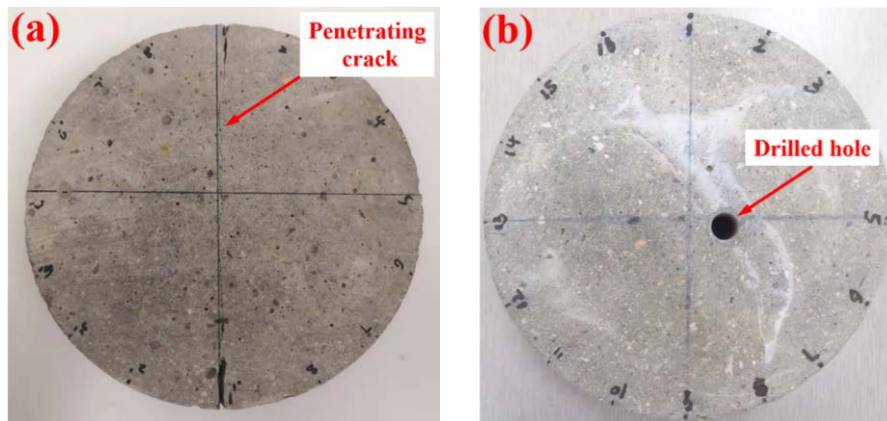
The mortar specimen with fabricated damage (a) With a penetrating crack (b) With a drilled hole
